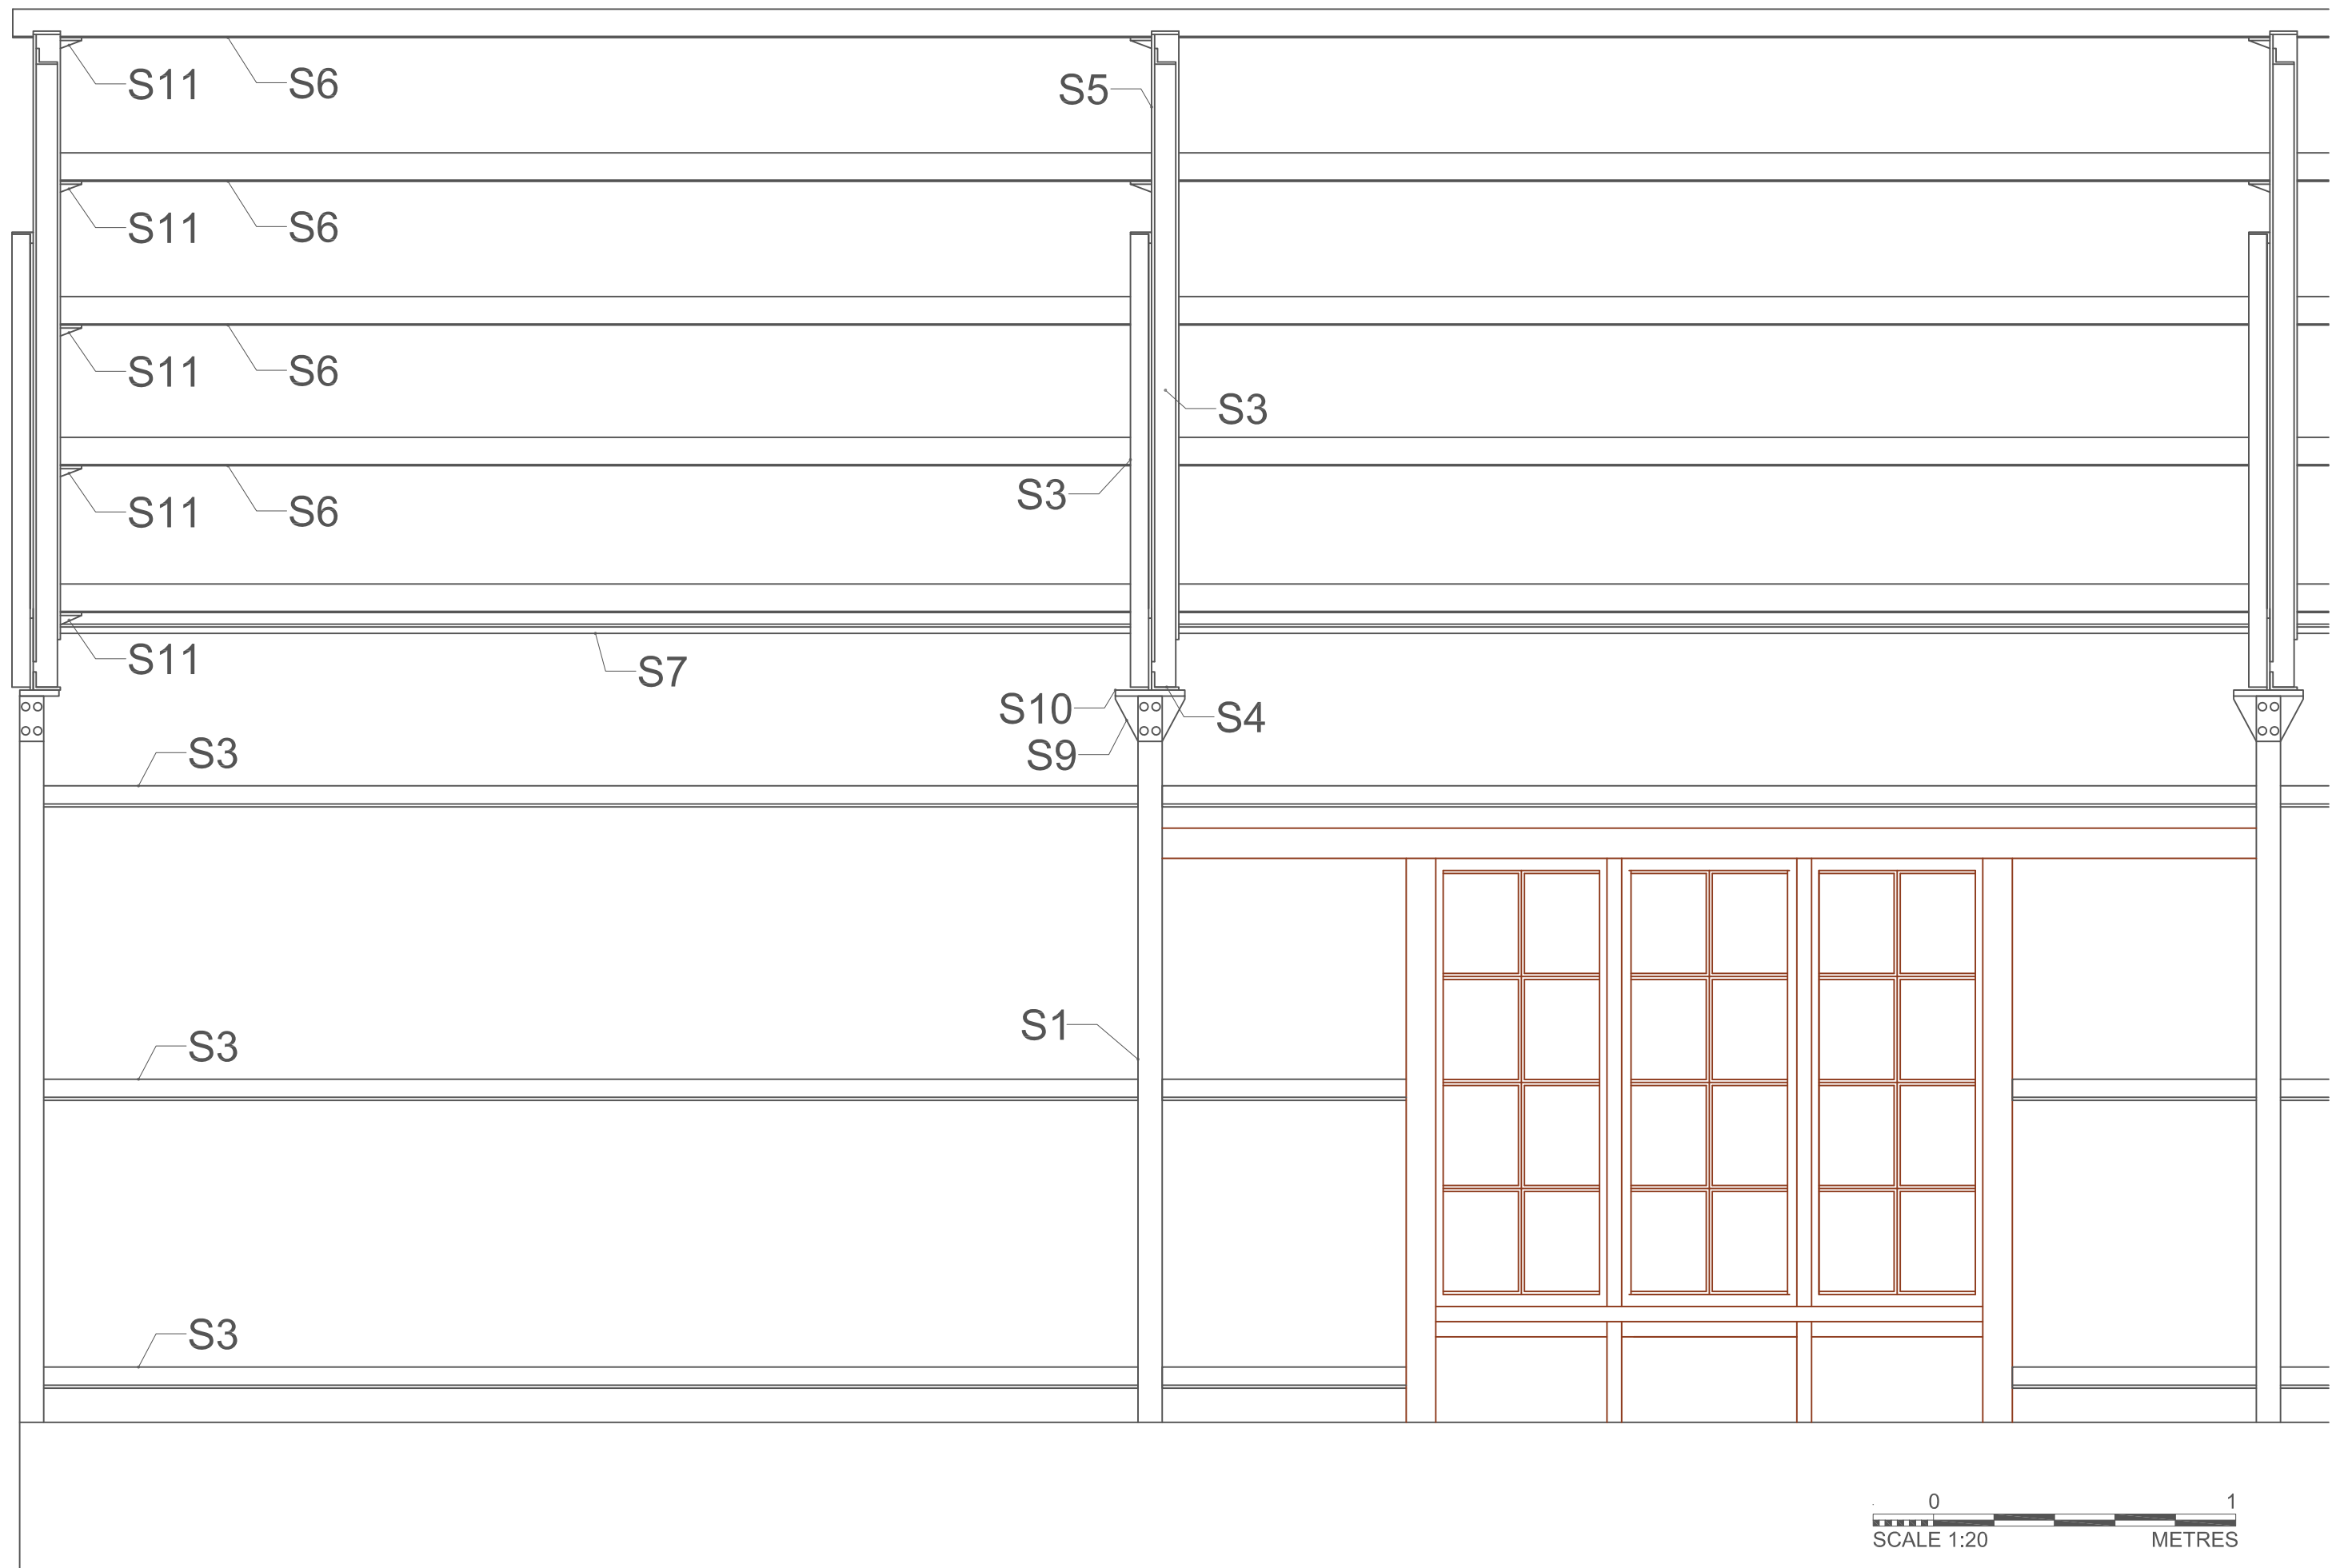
Section of steel frame of Locomotive Shed, building number 66.
